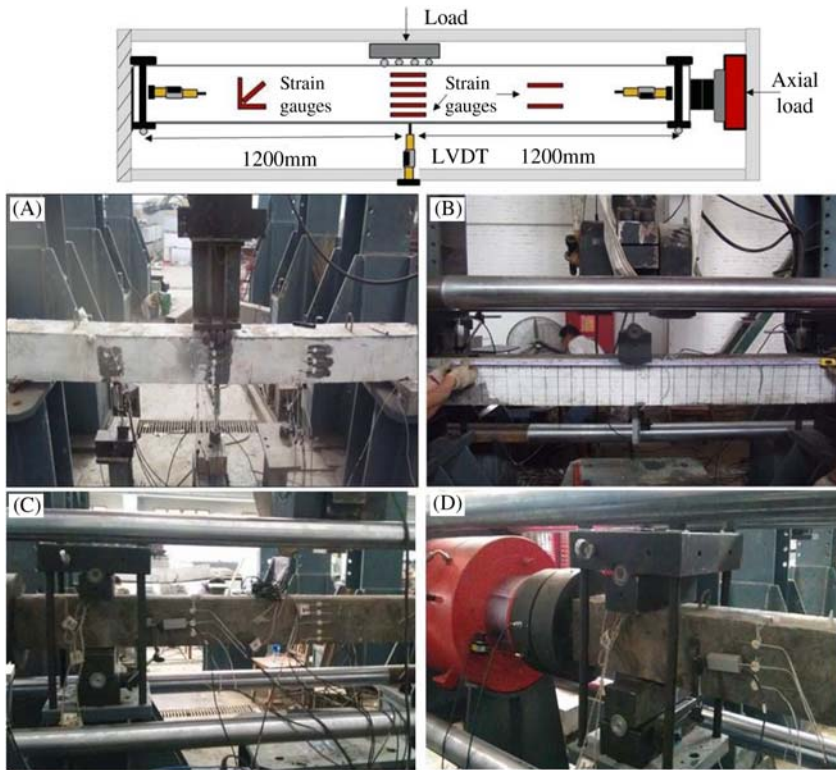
Test setup. (A) testing without axial loading. (B) testing with axial loading. (C) support of specimen, and (D) axial loading equipment.
